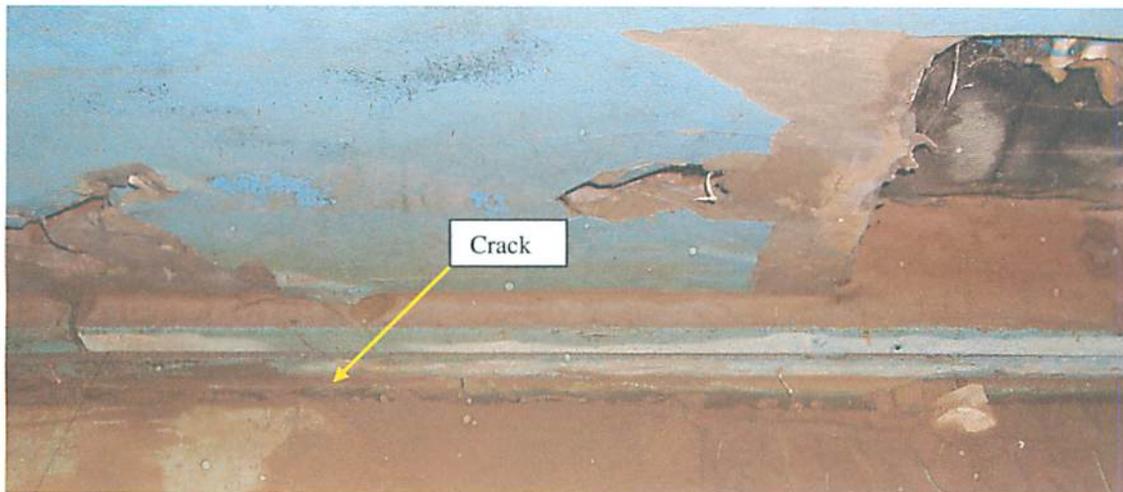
Crack in concrete floor slab is ½" to 1" wide.
